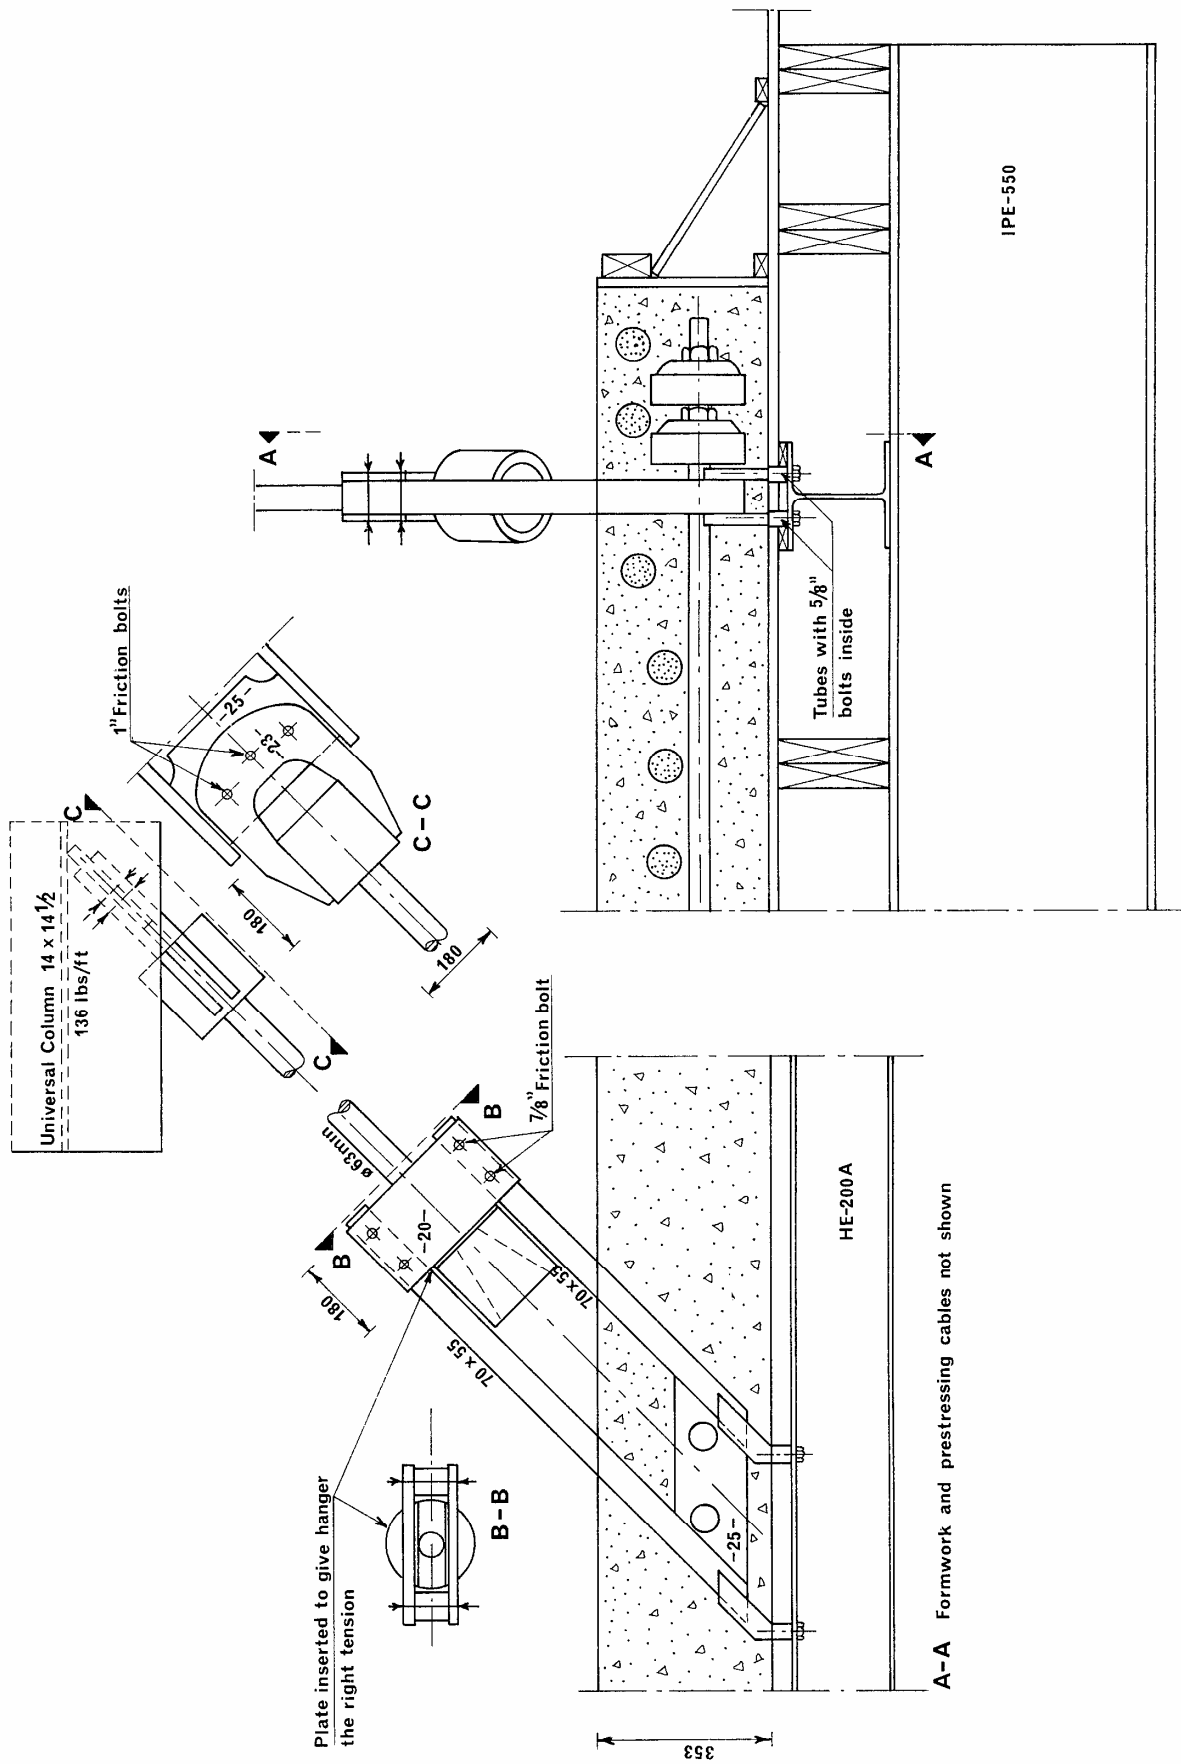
Tveit 73. Upper and lower ends of hangers with some details of slab and formwork.
